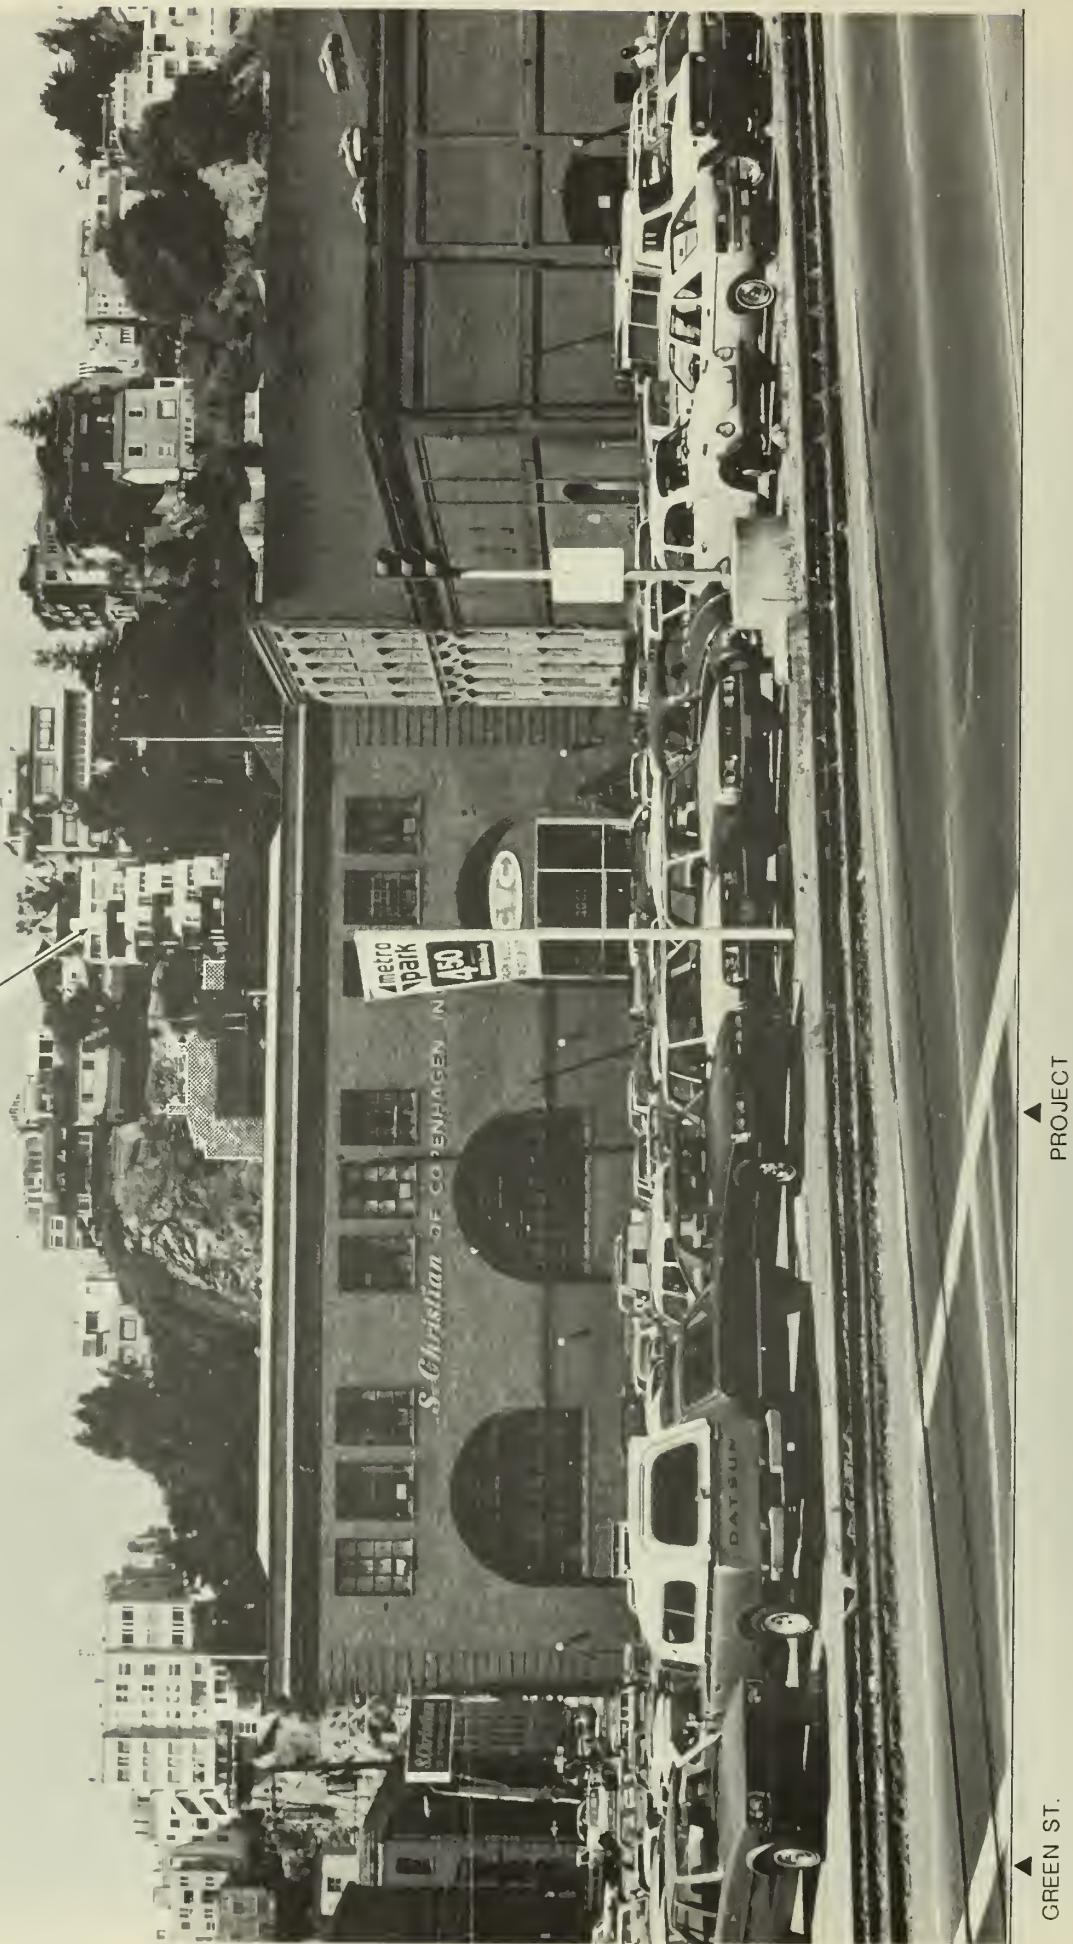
C: BUILDING OUTLINE MONTAGE OF THE PROJECT
